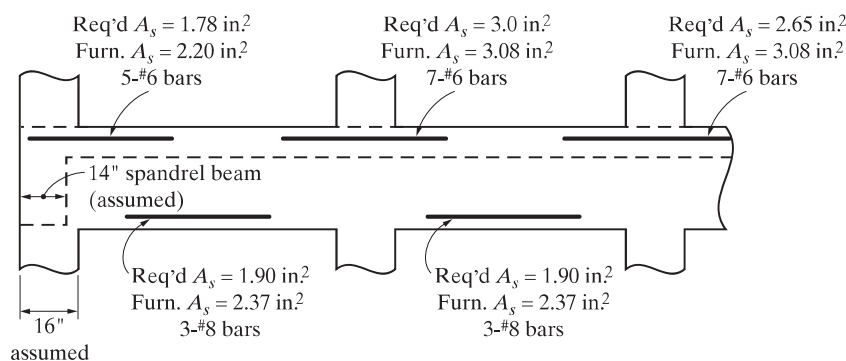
Work sketch for beam design of Example 6-1.
